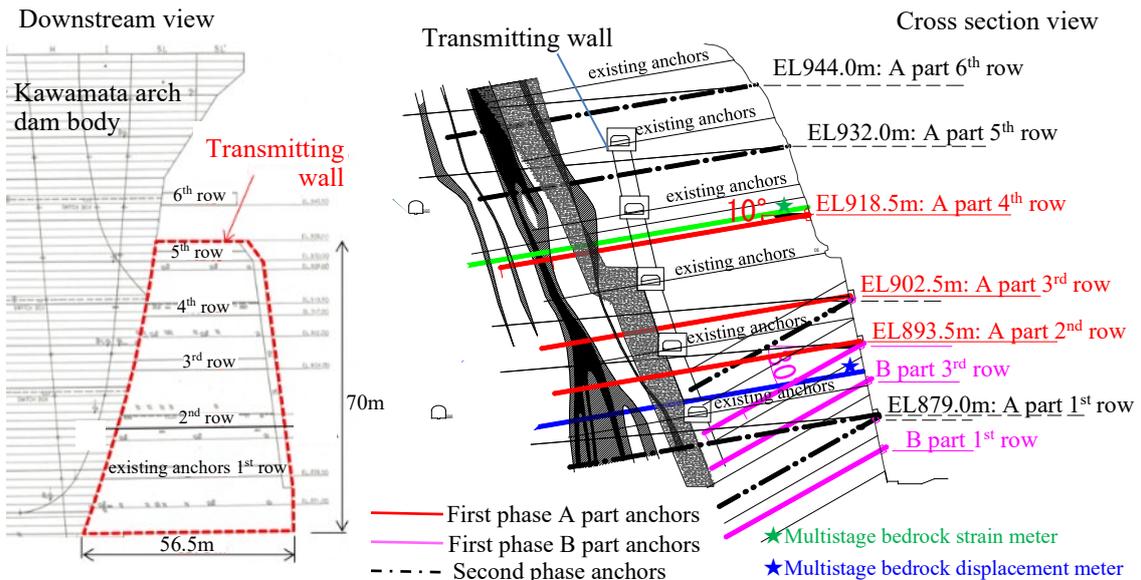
Downstream view and Cross section view of left bank on PS anchors and transmitting wall
